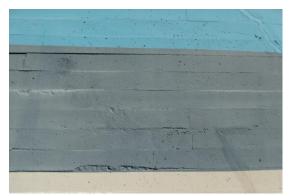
Painted board formed concrete on the southwest facade. View northeast
